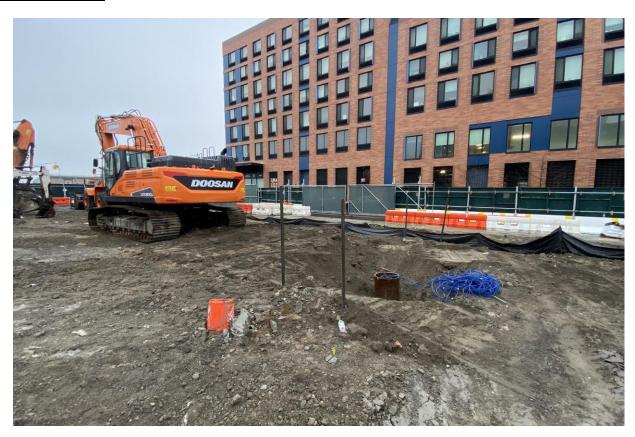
Excavation to support pile test in the western part of the site (facing southwest).
